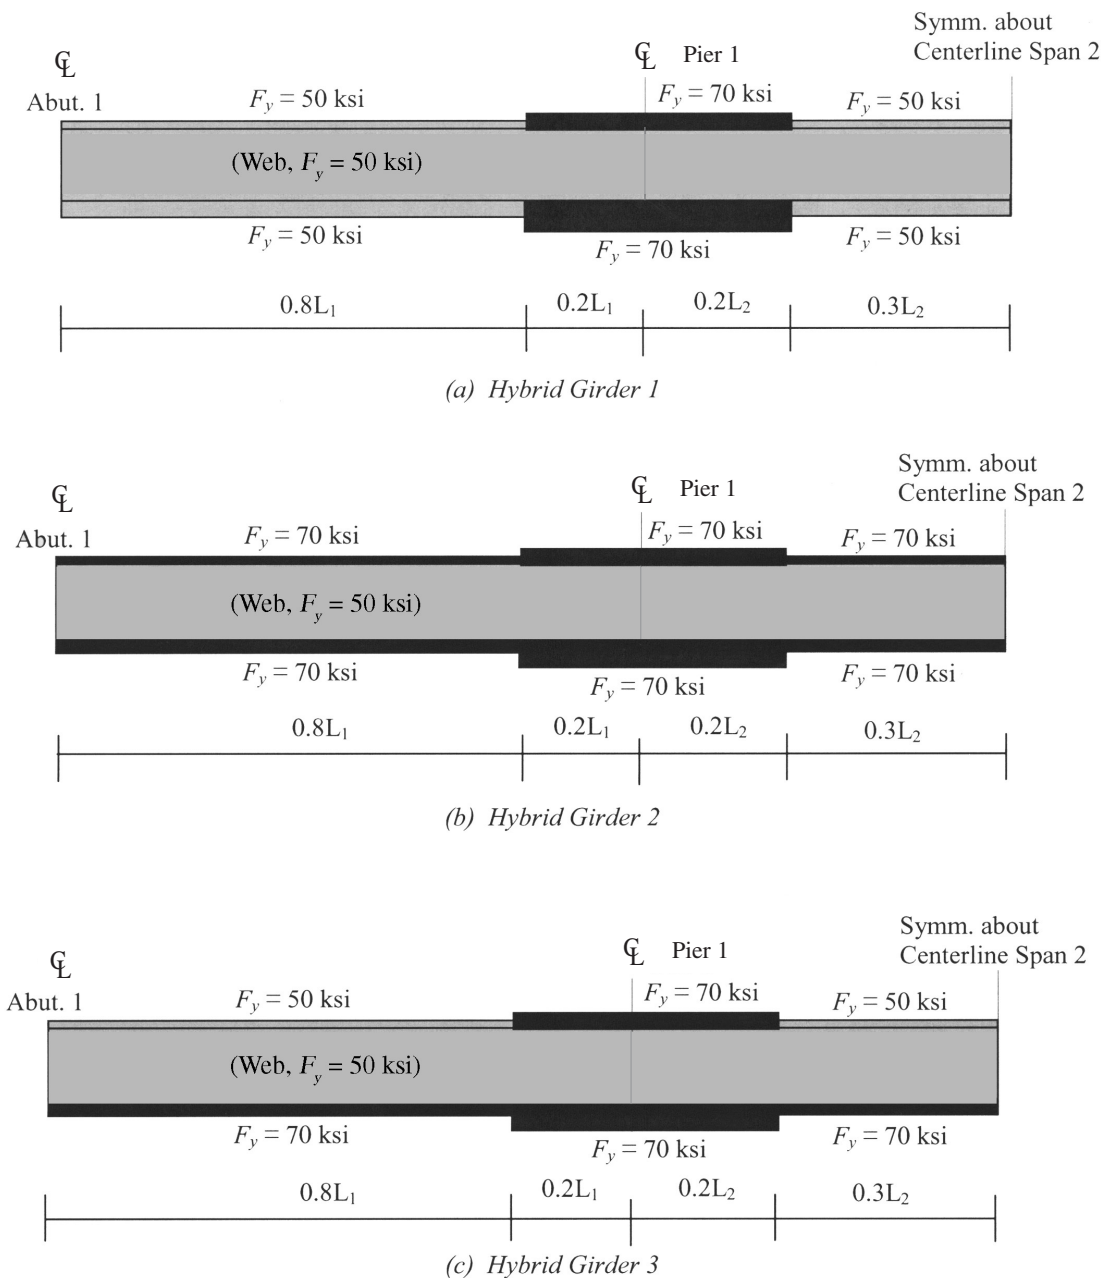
Hybrid Configurations: (a) Hybrid Girder 1, (b) Hybrid Girder 2, (c) Hybrid Girder 3.
